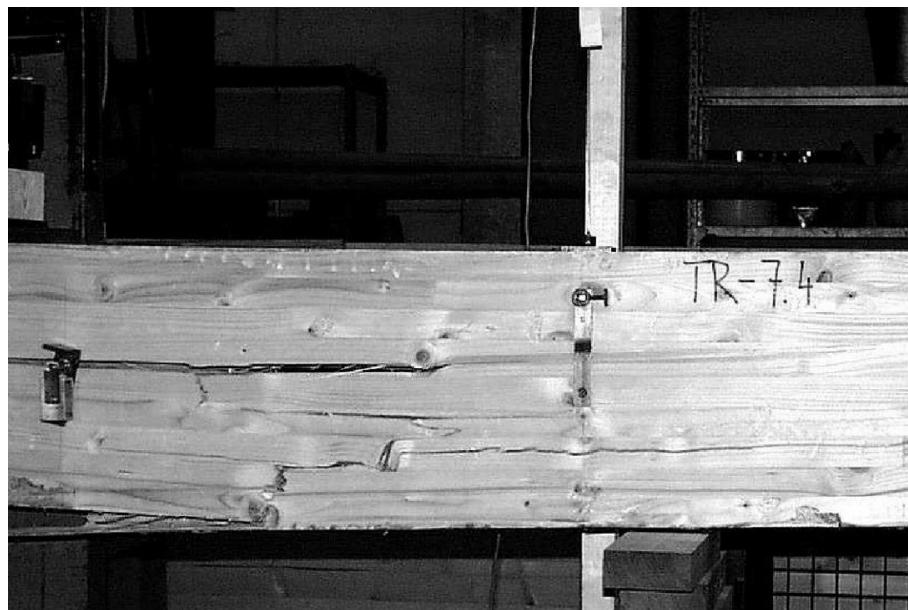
Failure outgoing from the lamella above the reinforcement plate (Blaß, Kramm, & Romani, 2002)
